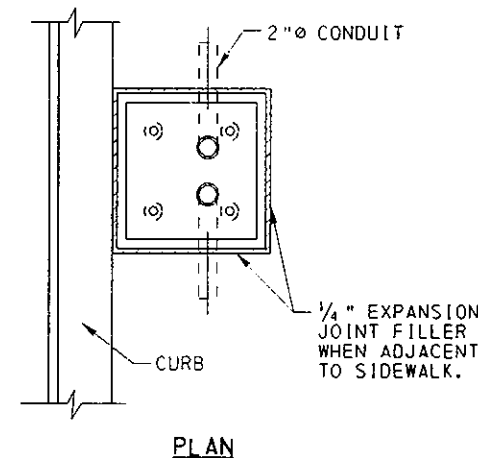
DETAIL FOR TYPE A POLE BASE FOR CUT OR LEVEL SECTION
